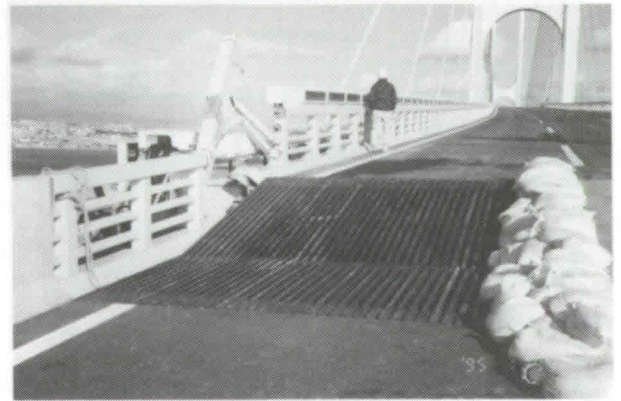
Lifted side span and fractured expansion joints due to broken Pendel shoes (Bayshore Route, Higashi Kobe Bridge)
